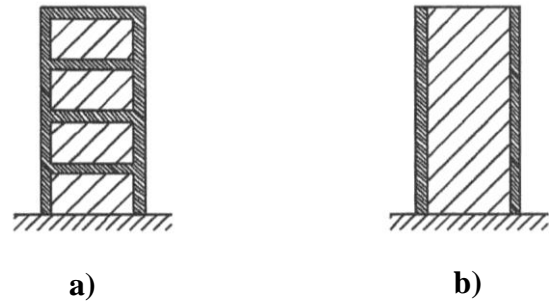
Composite structural systems. Composite walls: a) Type 1 – steel or composite moment frame with connected concrete infill panels; b) Type 2 – composite walls reinforced by connected encased vertical steel sections.
